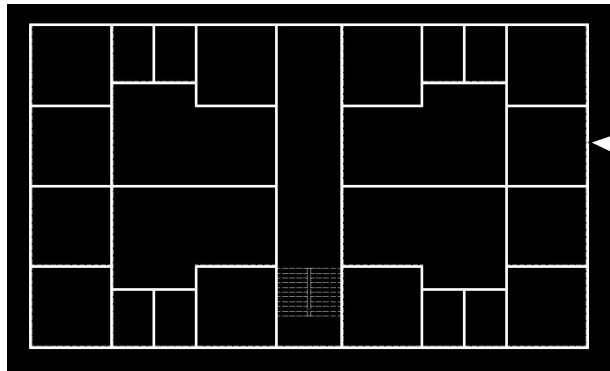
Centerline diagram of the beam and column of the building of the Framed Structure
